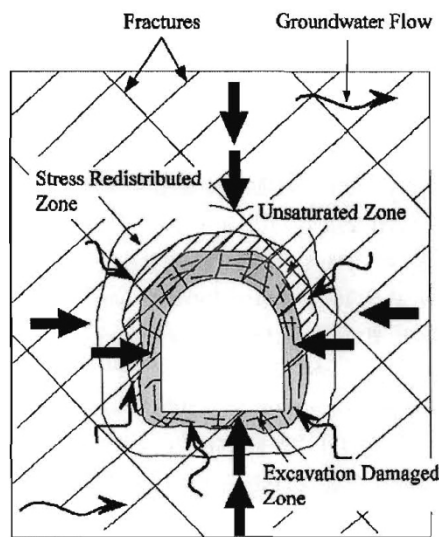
Development of EDZ around Underground Tunnel (Sato et al., 2000)
